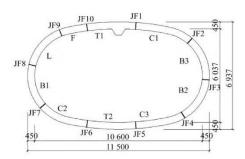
Section of column-free structure of class rectangular tunnel (mm)
